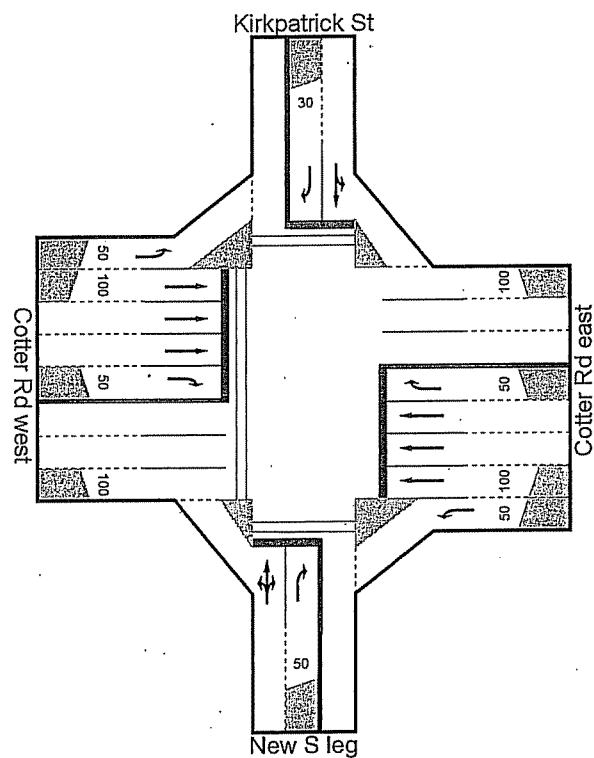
Possible Layout for Kirkpatrick Street/Cotter Road Intersection
